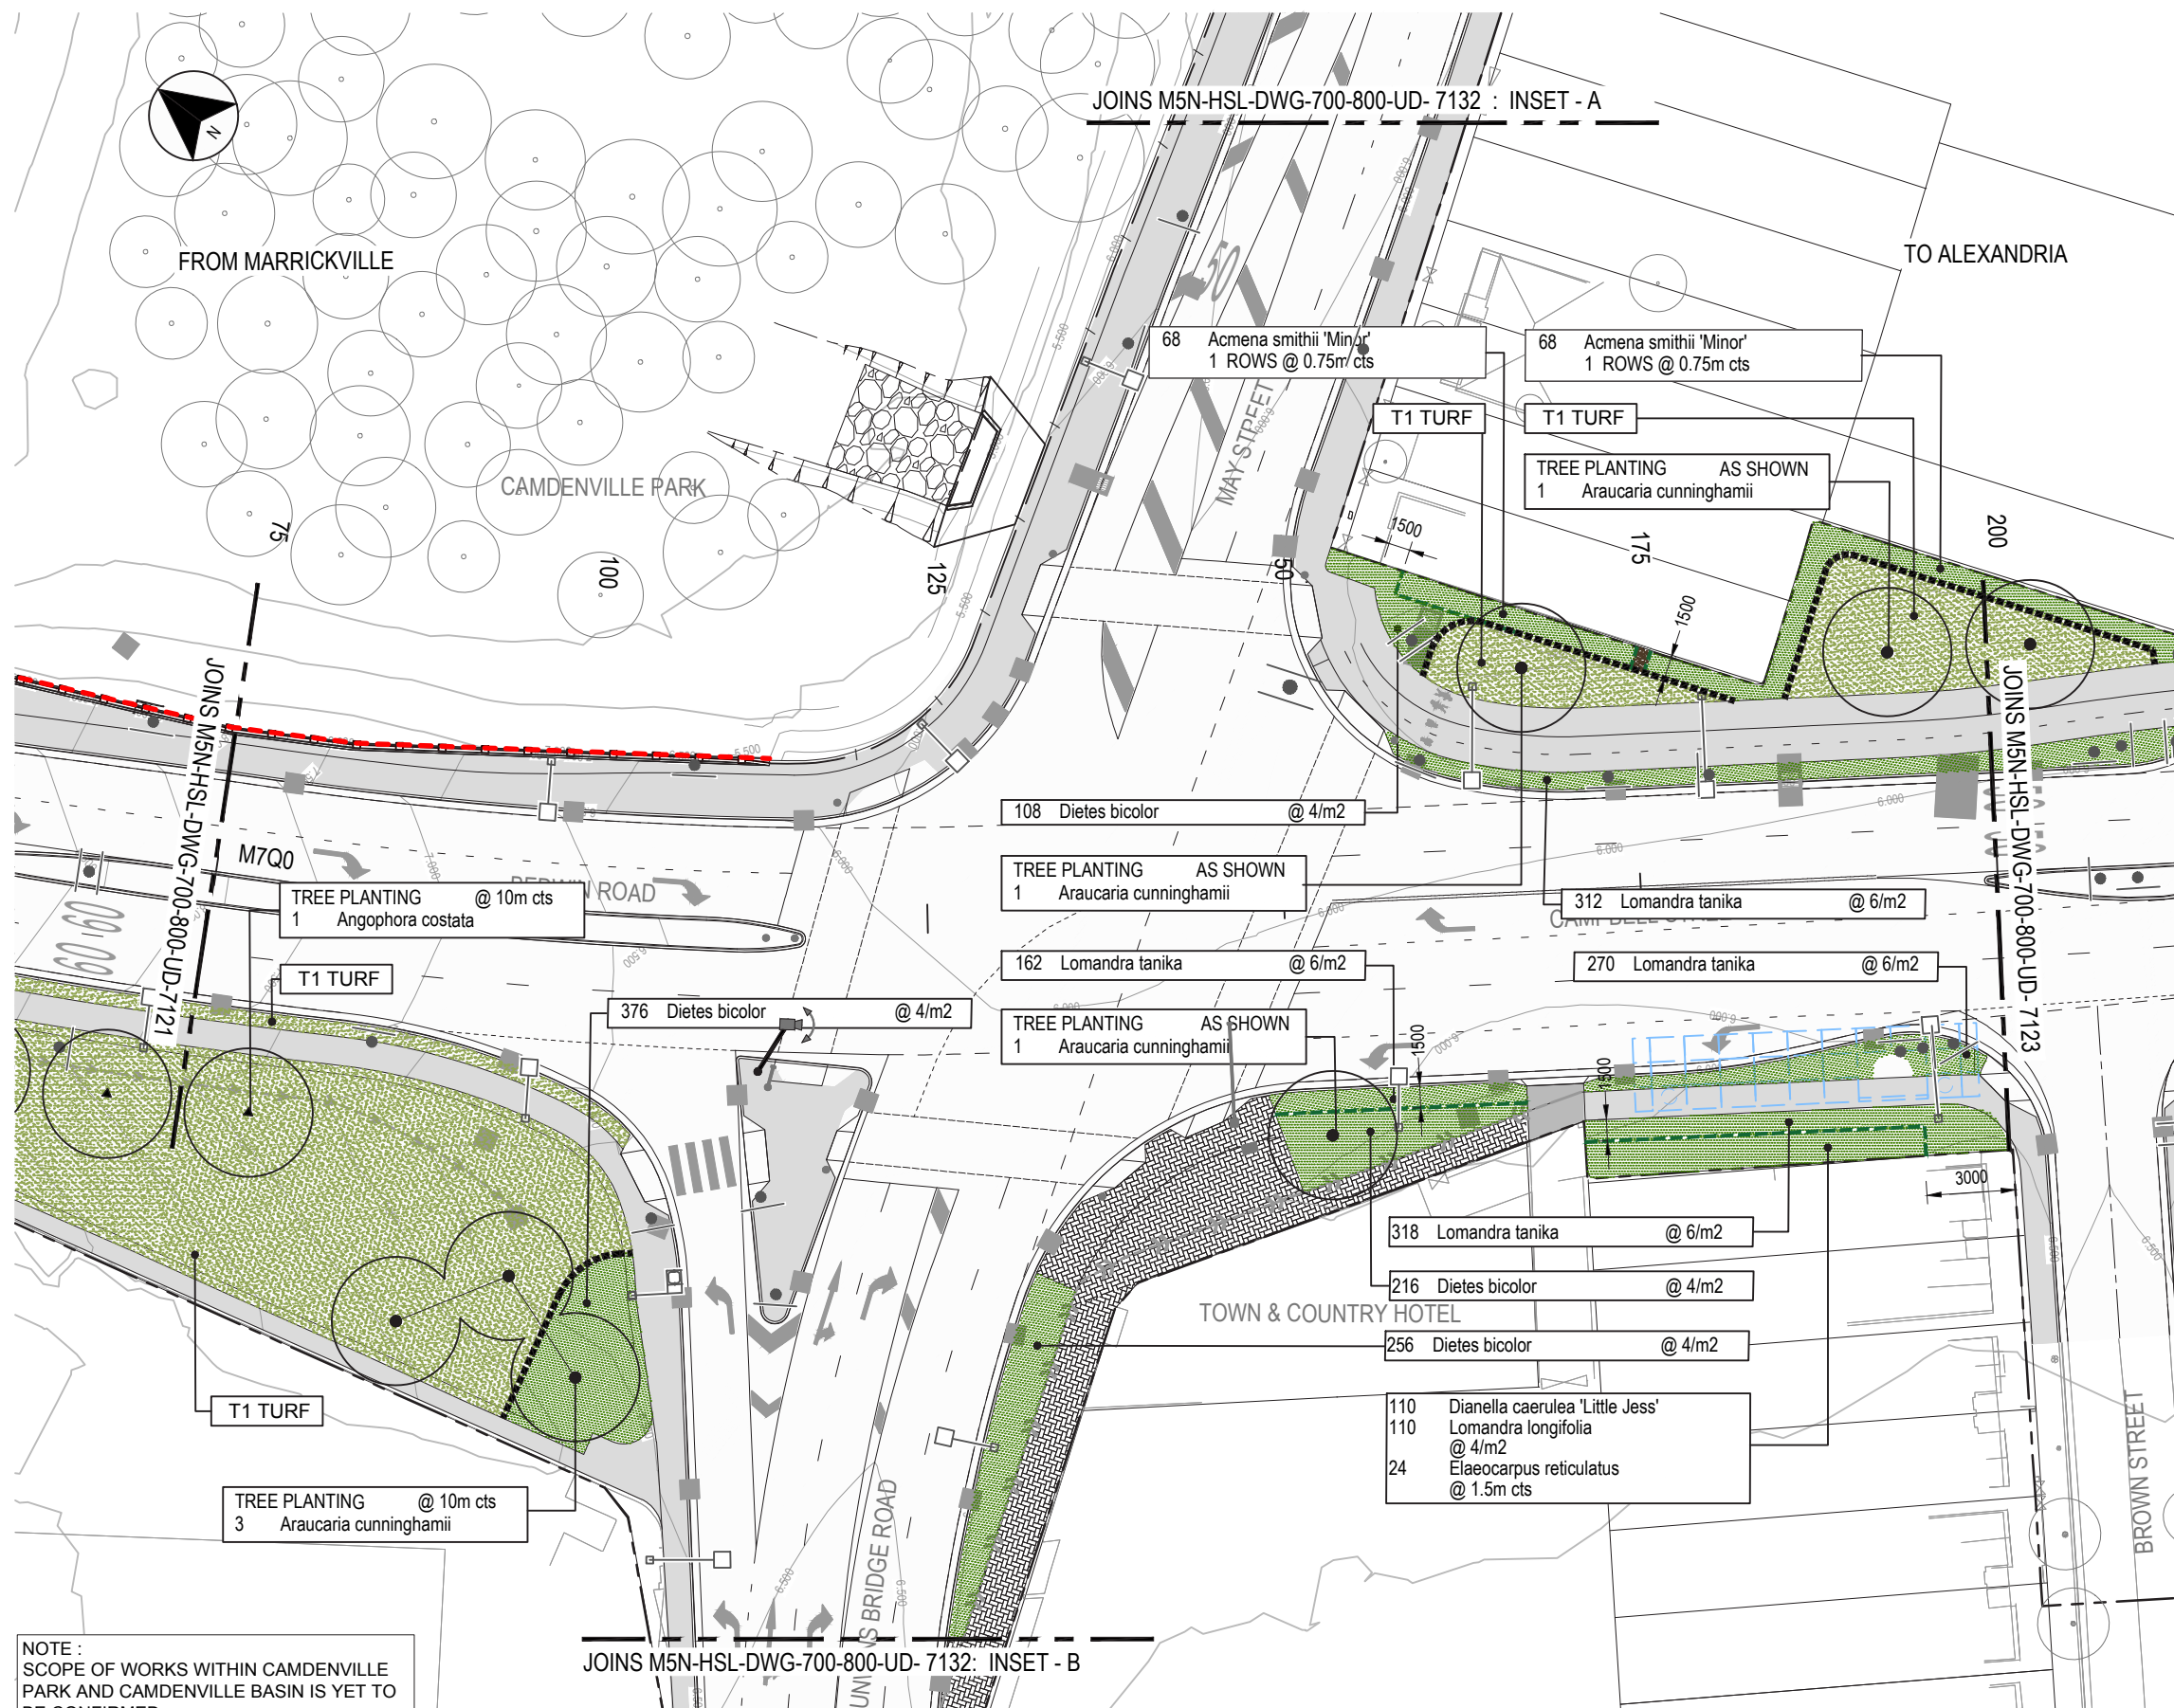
Campbell Street Green Link - Landscape Plans - Sheet 1 of 10
